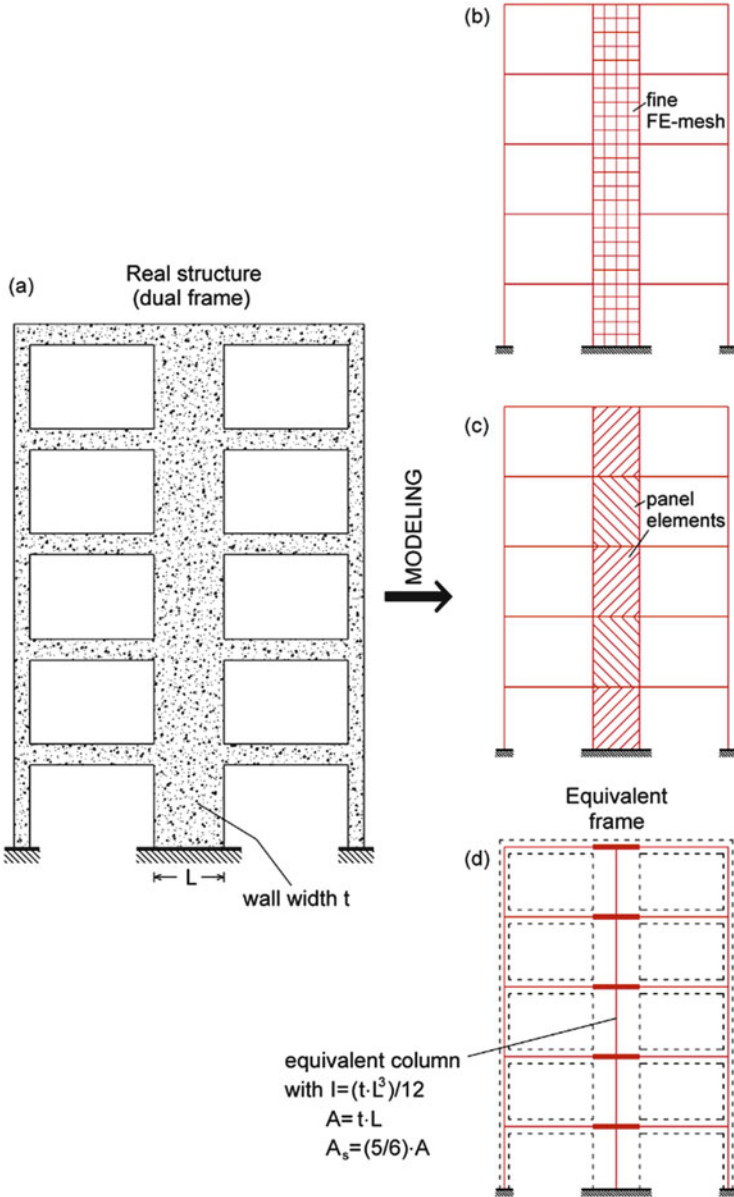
Finite element, panel, and equivalent frame models for a planar wall
